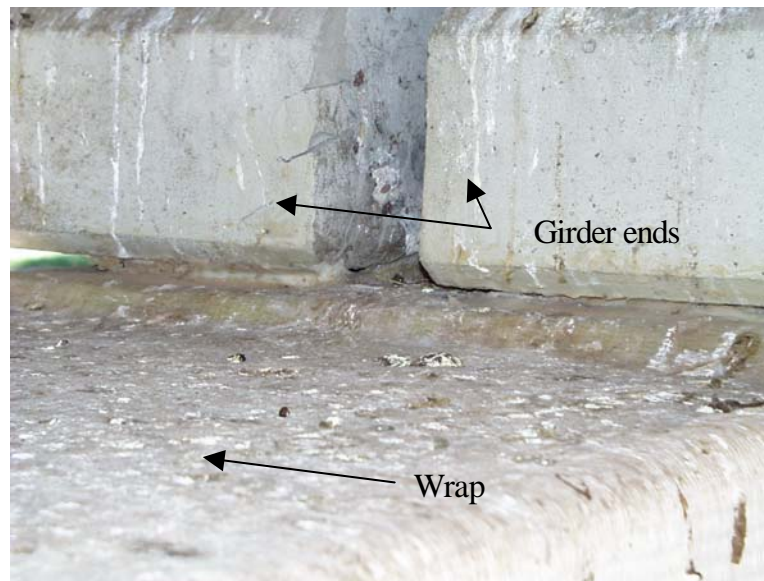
Finish of FRP wrap around girders of Structure #8.
